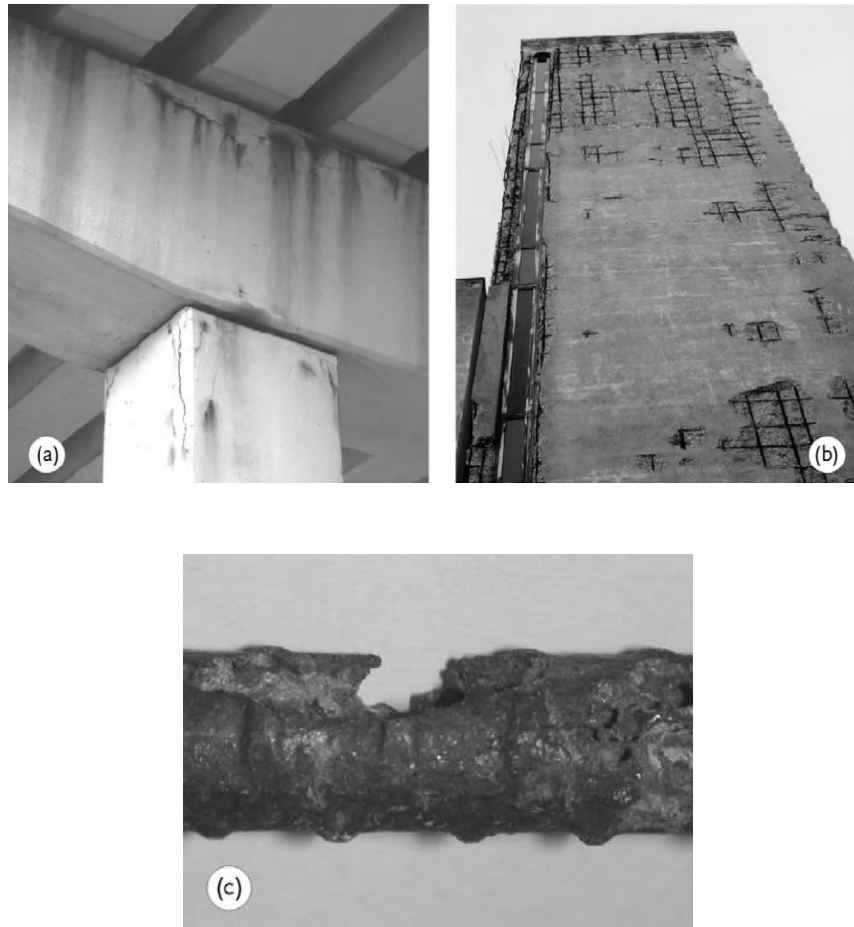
Concrete damage due to reinforcement corrosion, (a) surface cracks, (b) spalling and exposure of corroded rebars and (c) reduction in the cross section of reinforcement (Bertolini et al., 2013)
